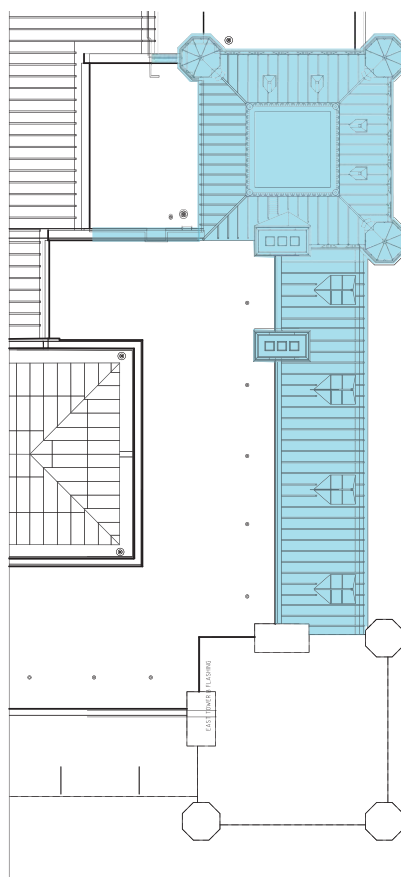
Plan of Centre Block, showing East and West Pavilions area of work.
